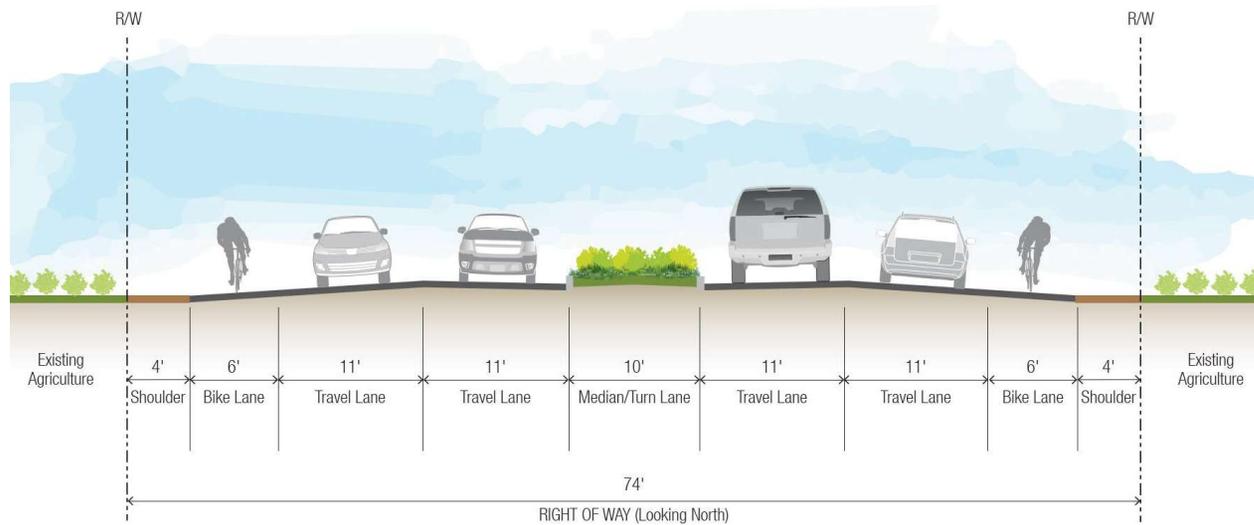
4-Lane Arterial Section: Agriculture Both Sides--Fanoe Road north from Rhone Way to Vista Lucia Parkway, Looking North
